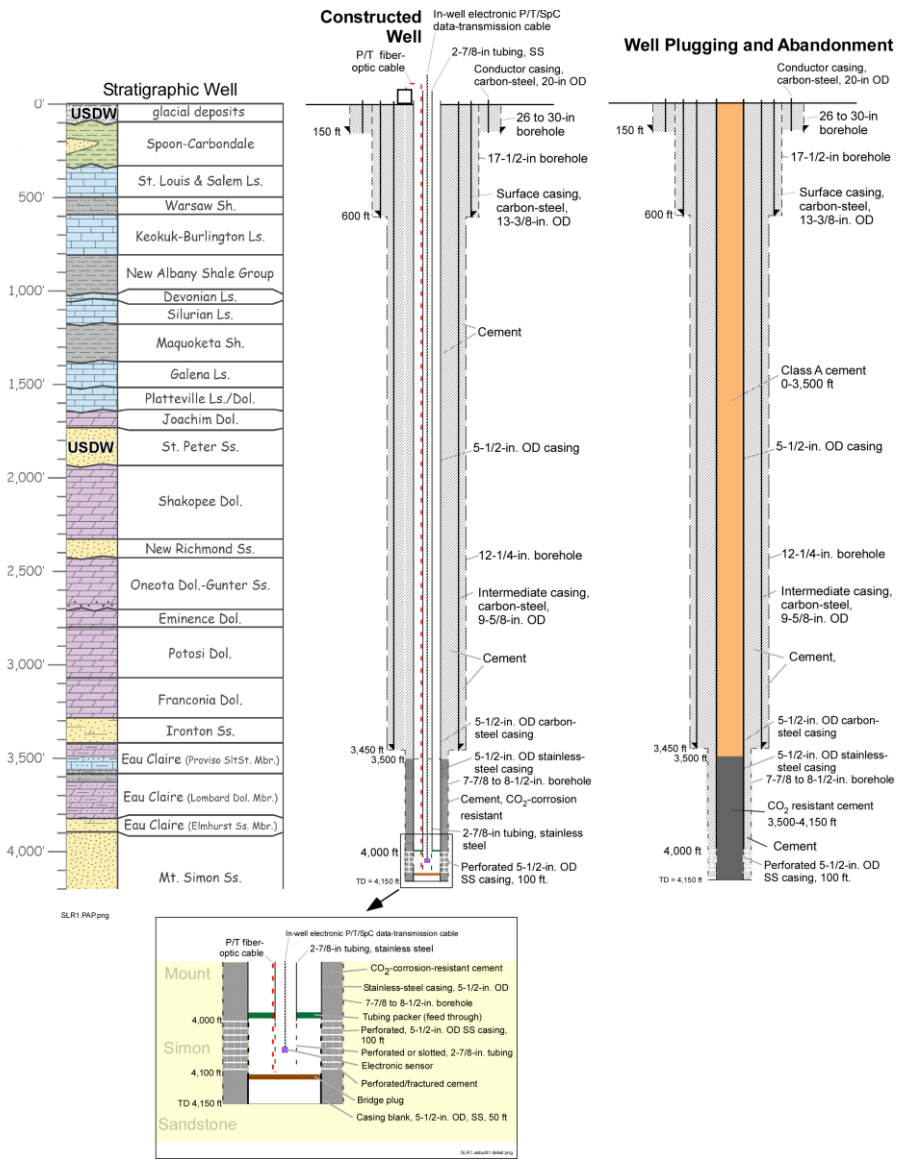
Construction design and plugging and abandonment plan for new 5.5-in.-diameter single-level in-reservoir monitoring well.
